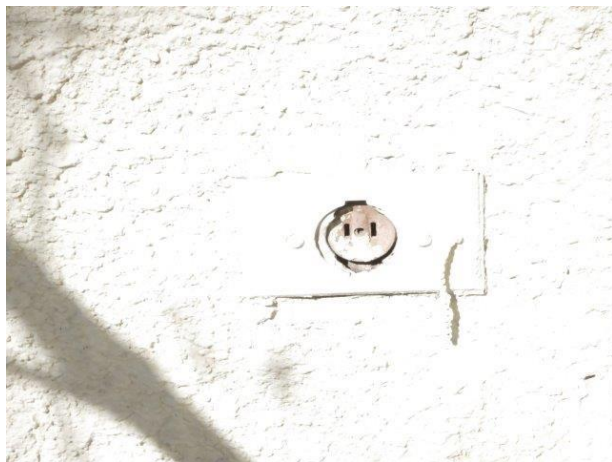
Unsealed, (and Non Grounded) Electrical Receptacle
